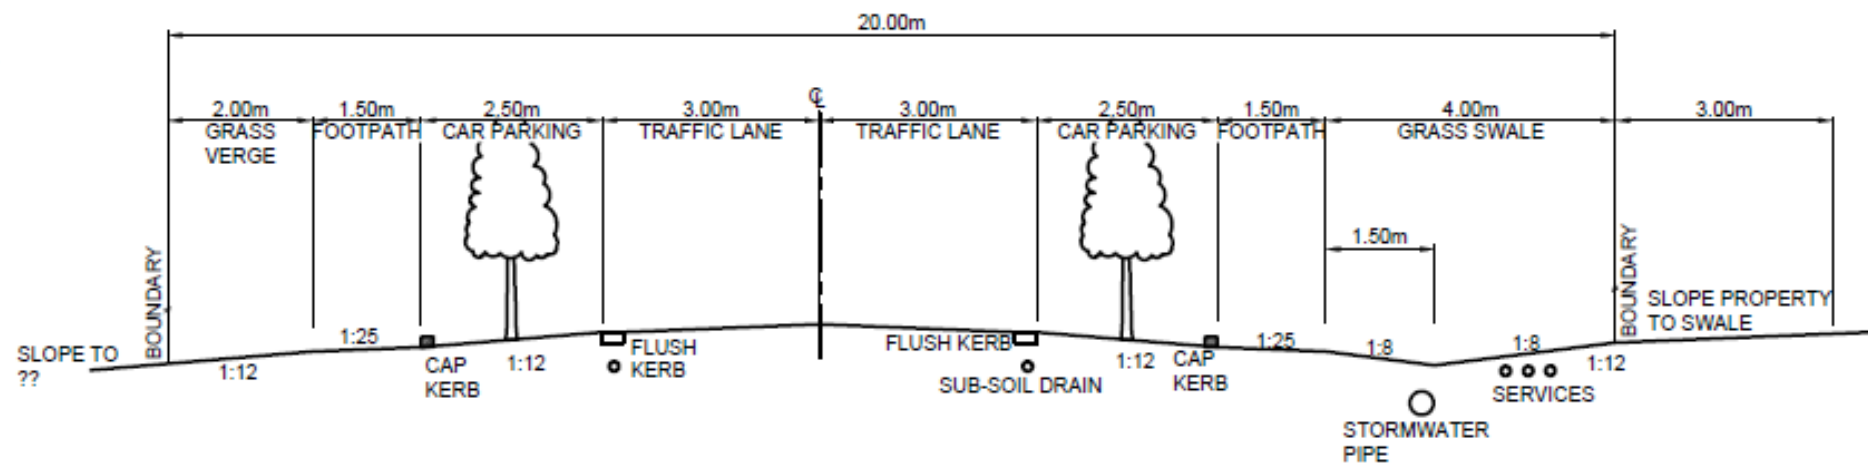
Te Kauwhata Structure Plan – Road cross sections – Greenway Corridor and Whangamarino Margin Roads
